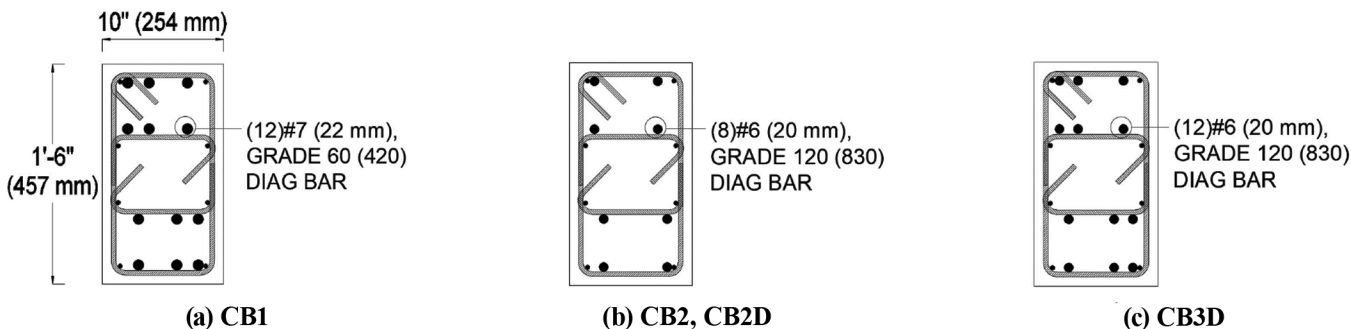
Coupling beam cross sections near wall intersection. Hoops and crossties are No. 3 (10 mm) Grade 60 (420) bars at 3 in. (75 mm); and secondary longitudinal bars are No. 3 (10 mm) Grade 60 (420) bars.
